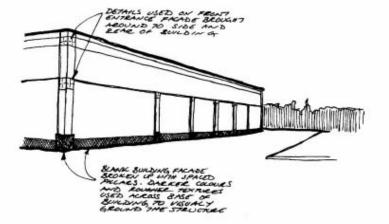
A blank wall can be broken up with windows, pillars, colours and other material details.
